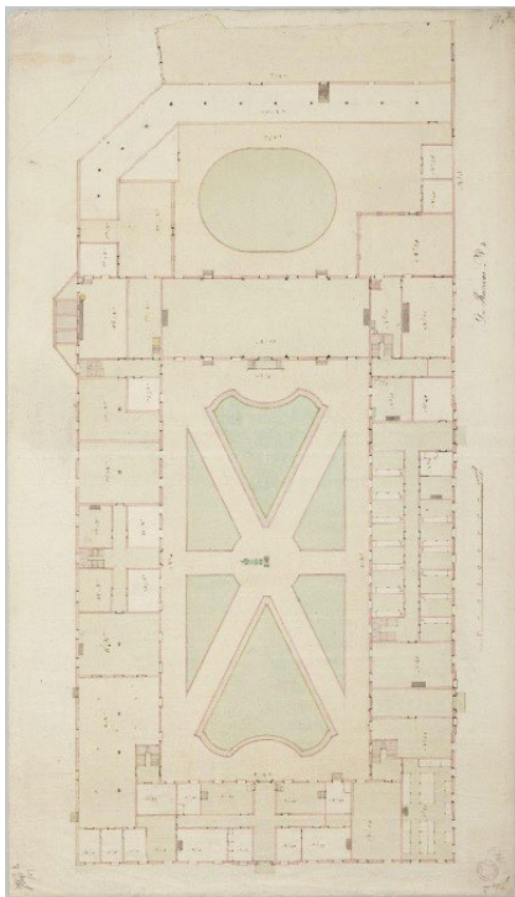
Koudenhorn ground floor plan 1768, Noord Hollands Archief (1768)
